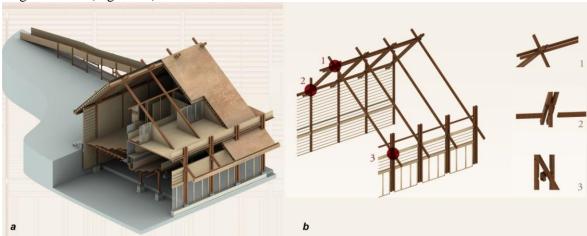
a. Isometric cross section; b. Detail of supporting structure's connections. (F.Stefano)
